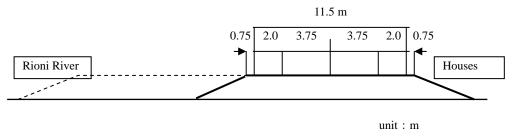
Standard Cross Section (Completed, Earthwork Section)
